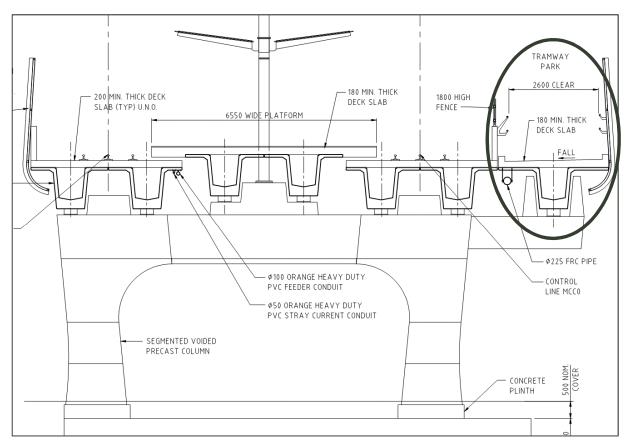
Typical Cross-section of the Tram Bridge and Shared Path Bridge (right side)
